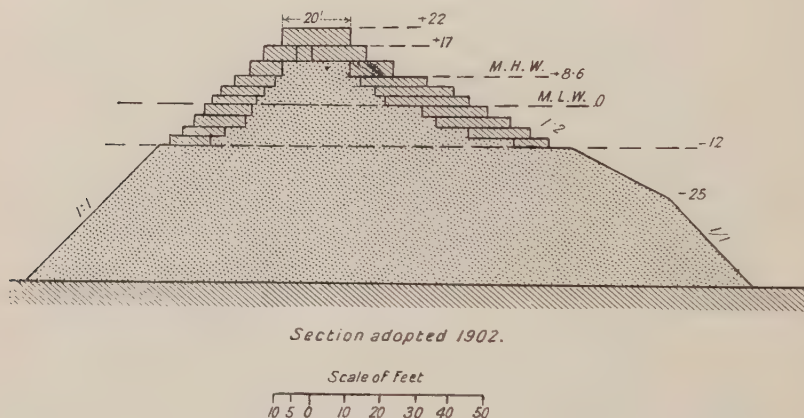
Section of Breakwater, Sandy Bay, U.S.A.
